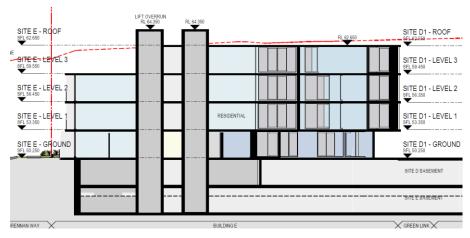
Height breach to Site E (Source: Rothe Lowman plans)
